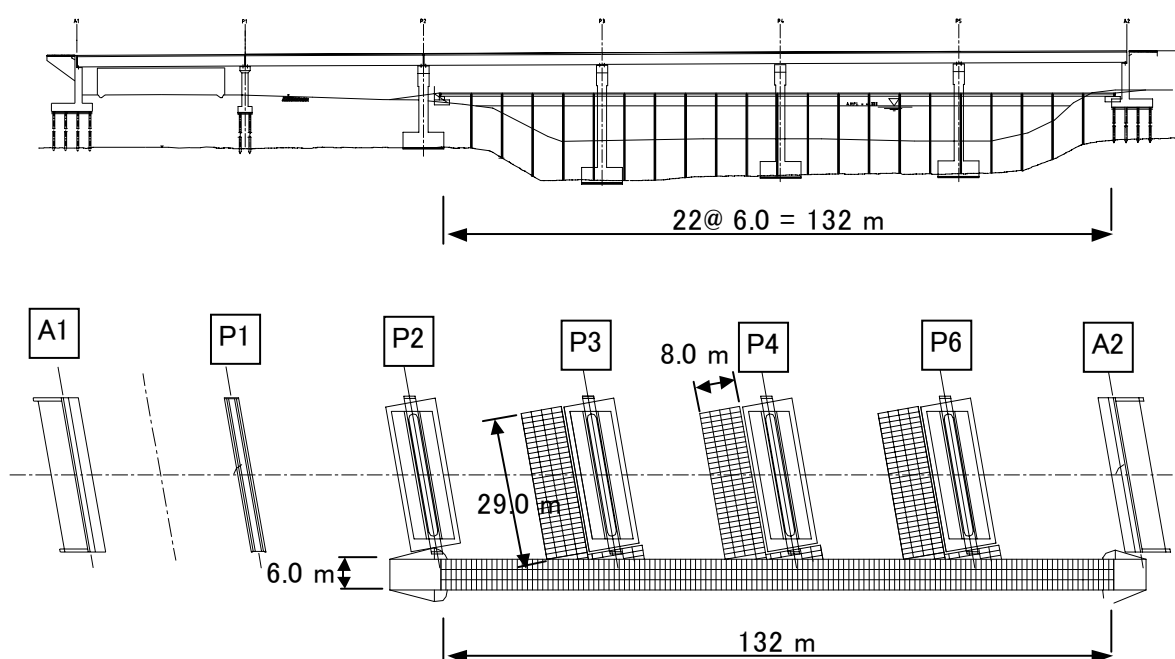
Temporary Bridge for Construction Kelani River Bridge
